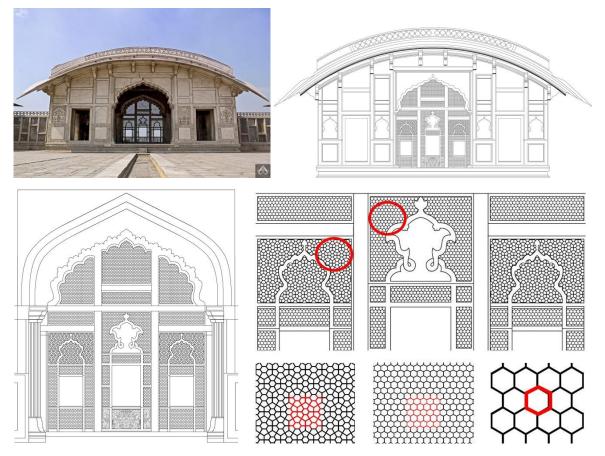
The Naulakha Pavilion. (Mir, 2011). Drawings of the pavilion. The central arch of Naulakha Pavilion, with intricate patterns carved out from marble. The screens on the central window are different compared to the side panels windows frame, but the basic pattern is same, the hexagon. The pattern tessellation drawn by authors
